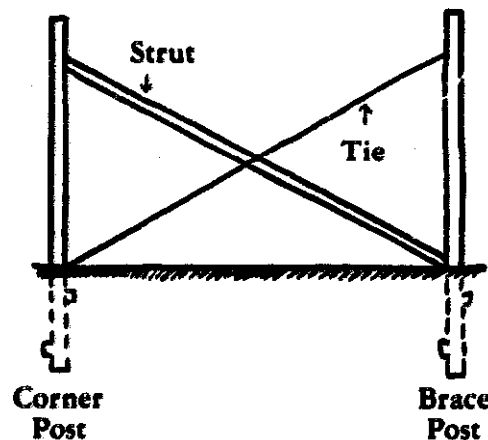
Bracing a corner post with a crossed strut and tie, and with cleats.
